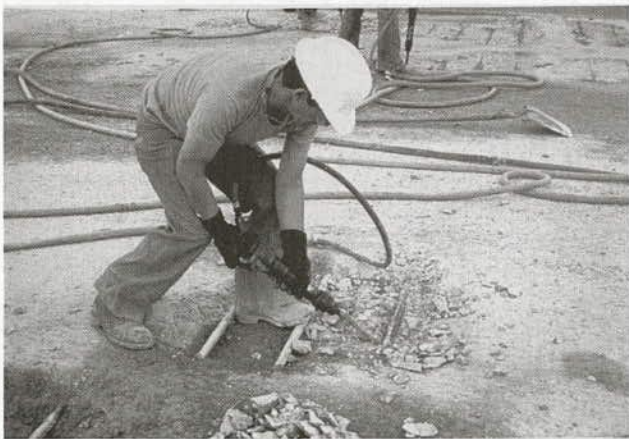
Use of a chipping hammer to remove concrete from around the reinforcement.
